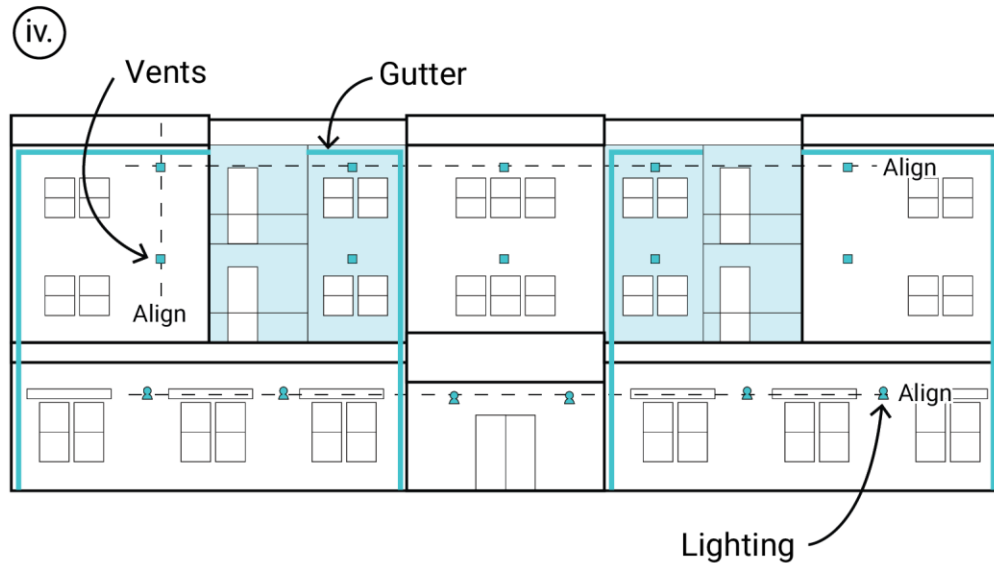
(B)(5)(a)(iv): Building equipment alignment
